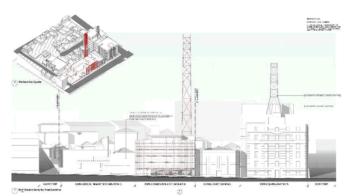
Sandy Bay Road elevation (source: Scanlan Architects)
